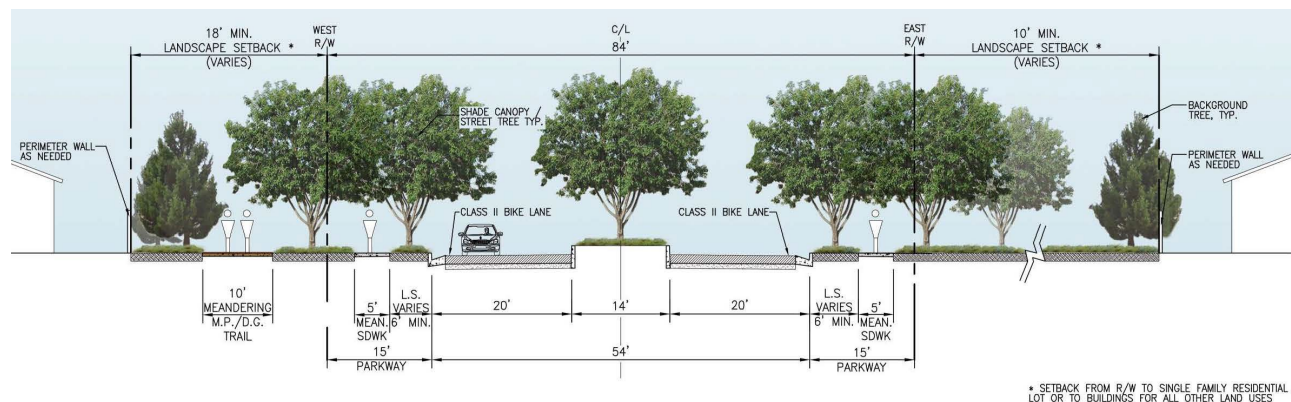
, Secondary Residential Entry Streetscape Concept
